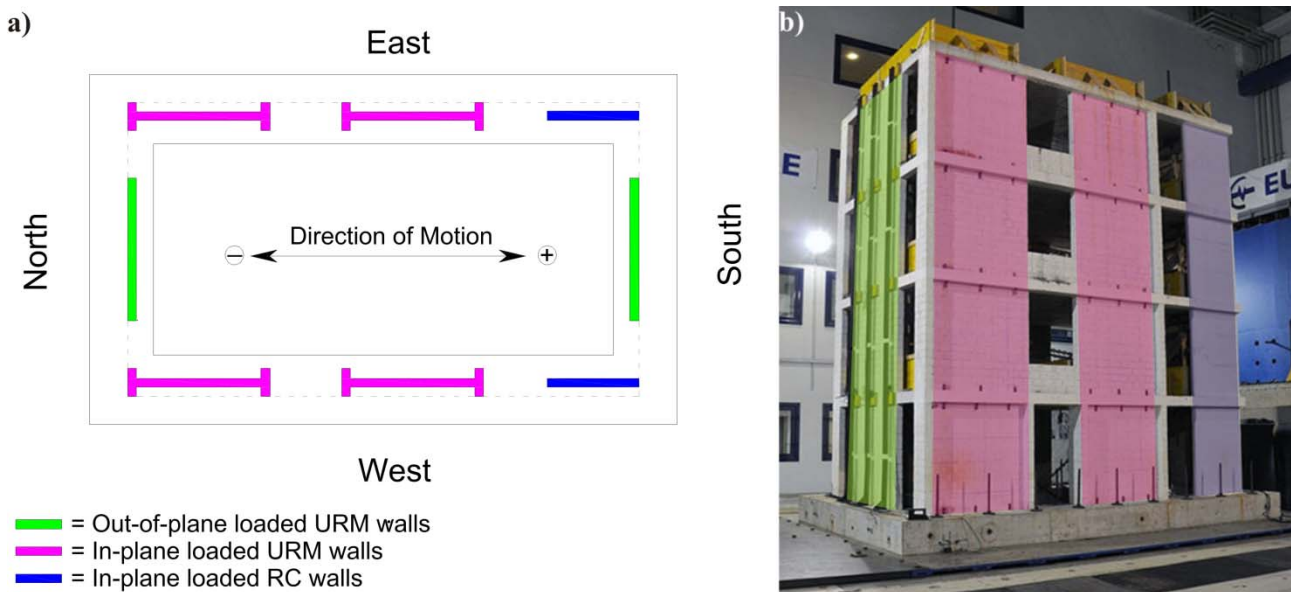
Test specimen: a) plan view and b) North-West view.
